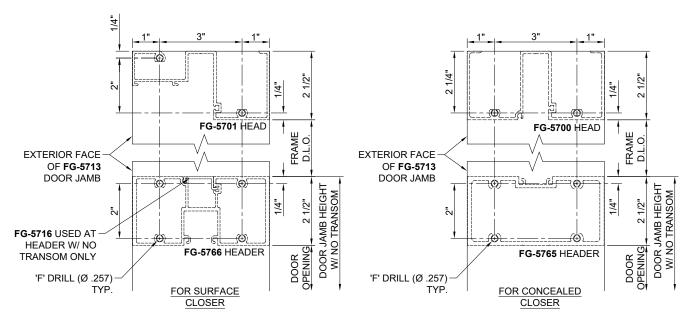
Fabrication for FG-5700 StormMax® Framing at Transom Head and Door Header
